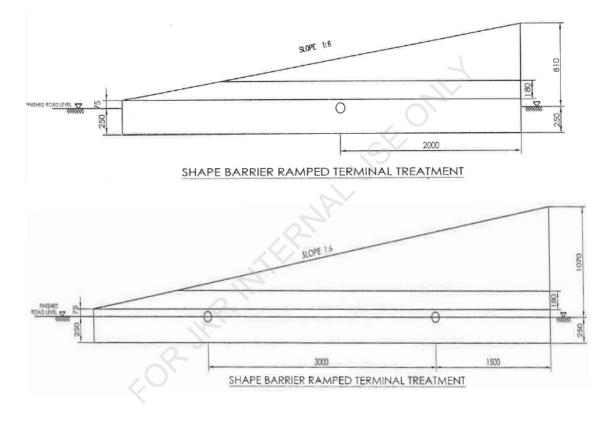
Reinforced Concrete Barrier Terminal Treatment
